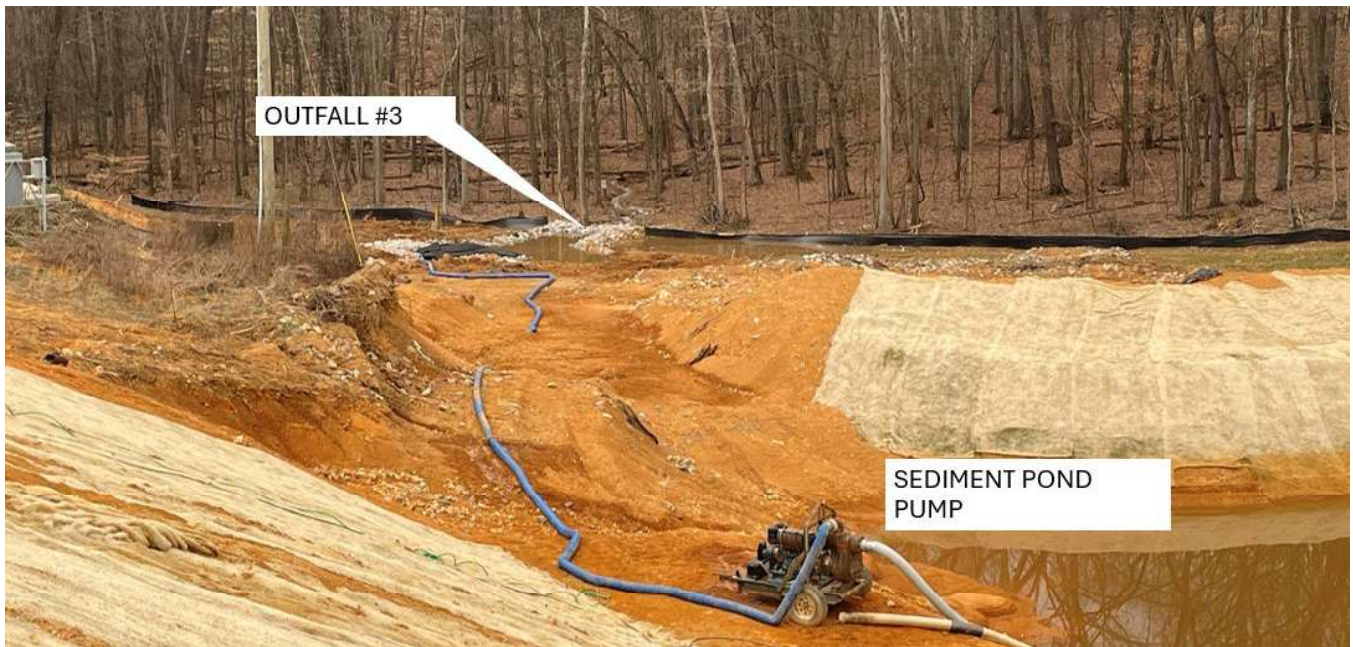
Sediment Pond #3 Outfall (AOC 7)(Woods are off-site)
